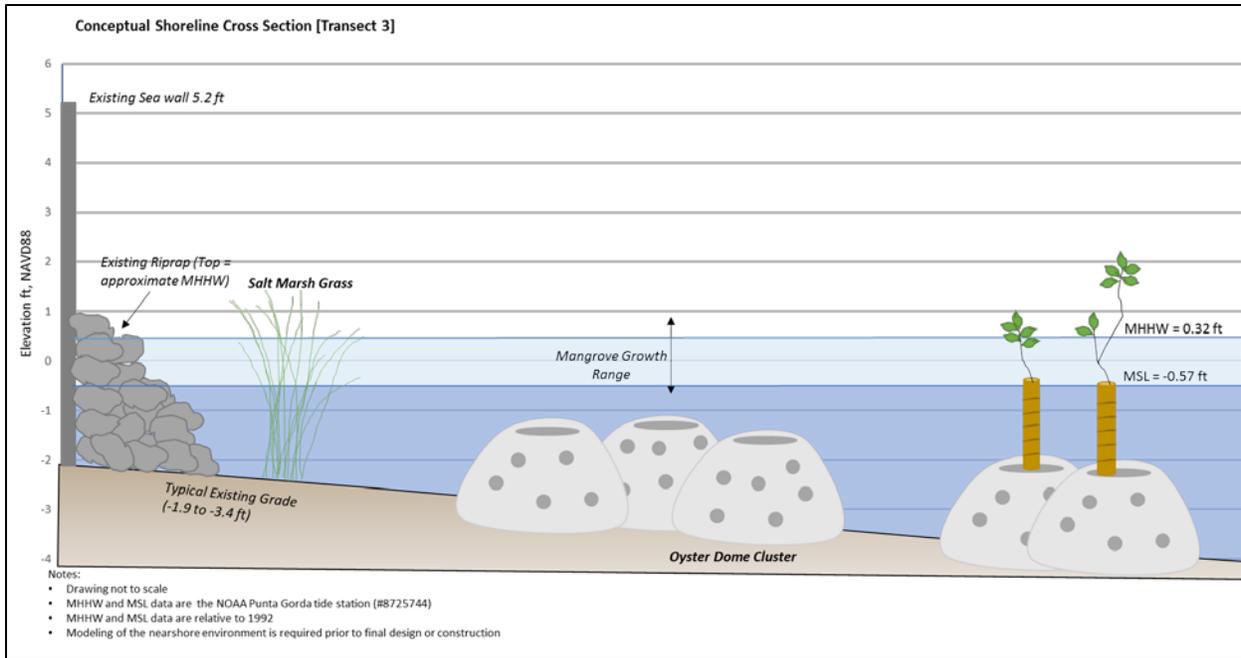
Sample Cross Section of Alternative 2 with Planted and Non-Planted Oyster Domes
